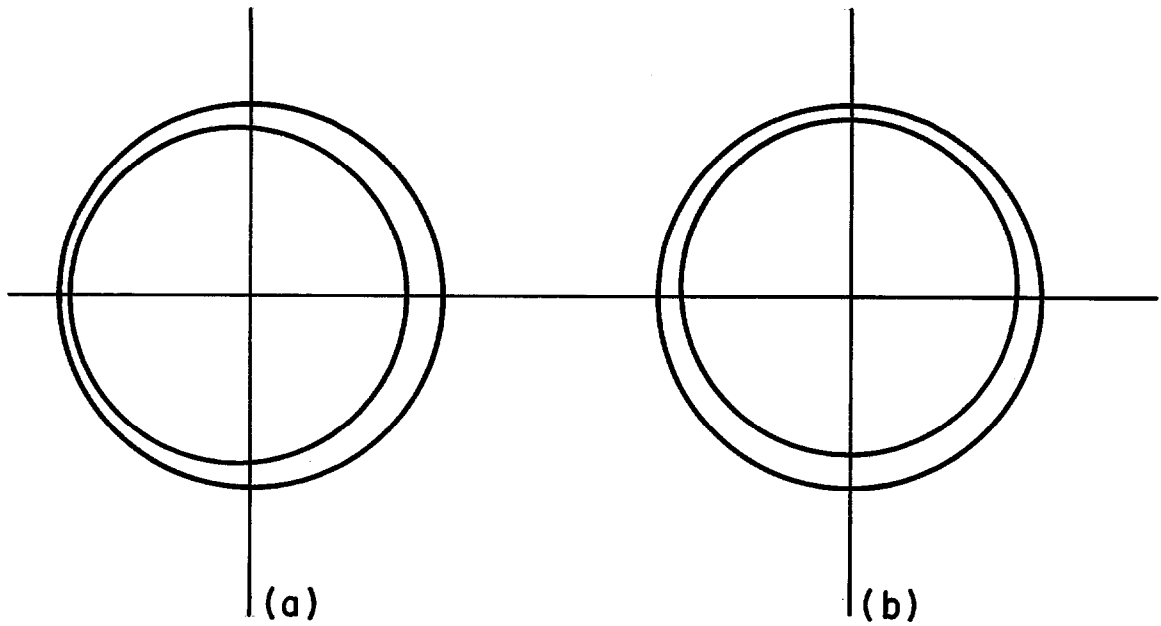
Nonuniform concrete pipe for tunnel. Successive concrete plugs go into separate pipe sections which are then rotated with respect to each other, as (a) to (b), in order to avoid aligning cracks along plug edges.
